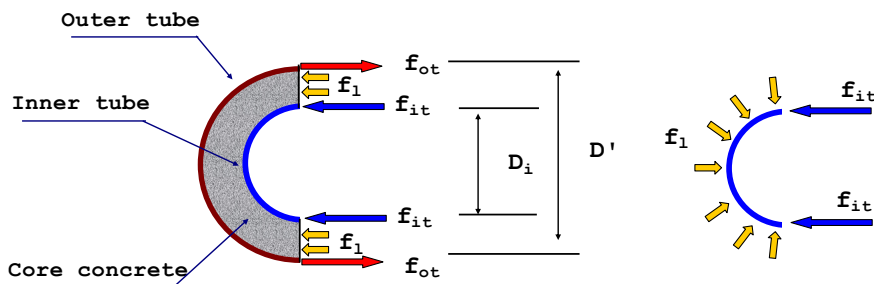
Confining stress on concrete in DSCT column (Han *et al.* 2010)
